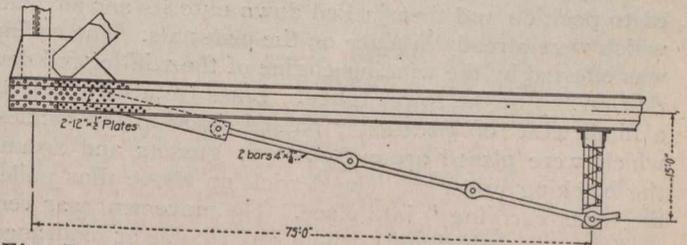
Method of Bolting and Trussing Bottom Chord for a One-Piece Erection.
